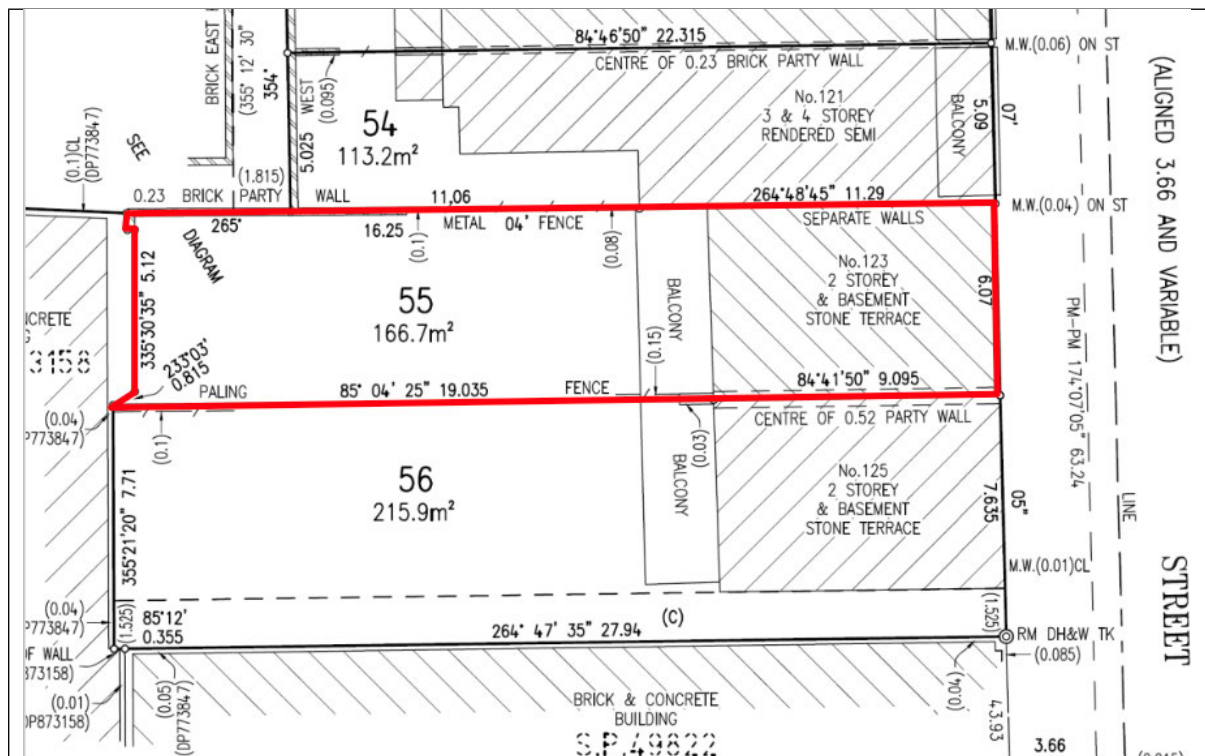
, Site survey, showing our property, 123 Kent Street, outlined in red.
